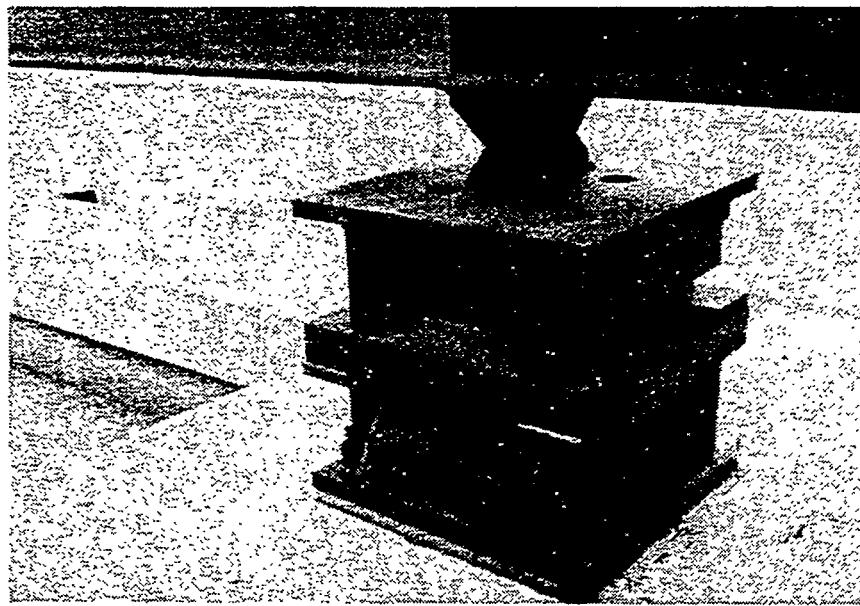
Sliding Bearings for Passageway between Isolated and Fixed Laboratories
